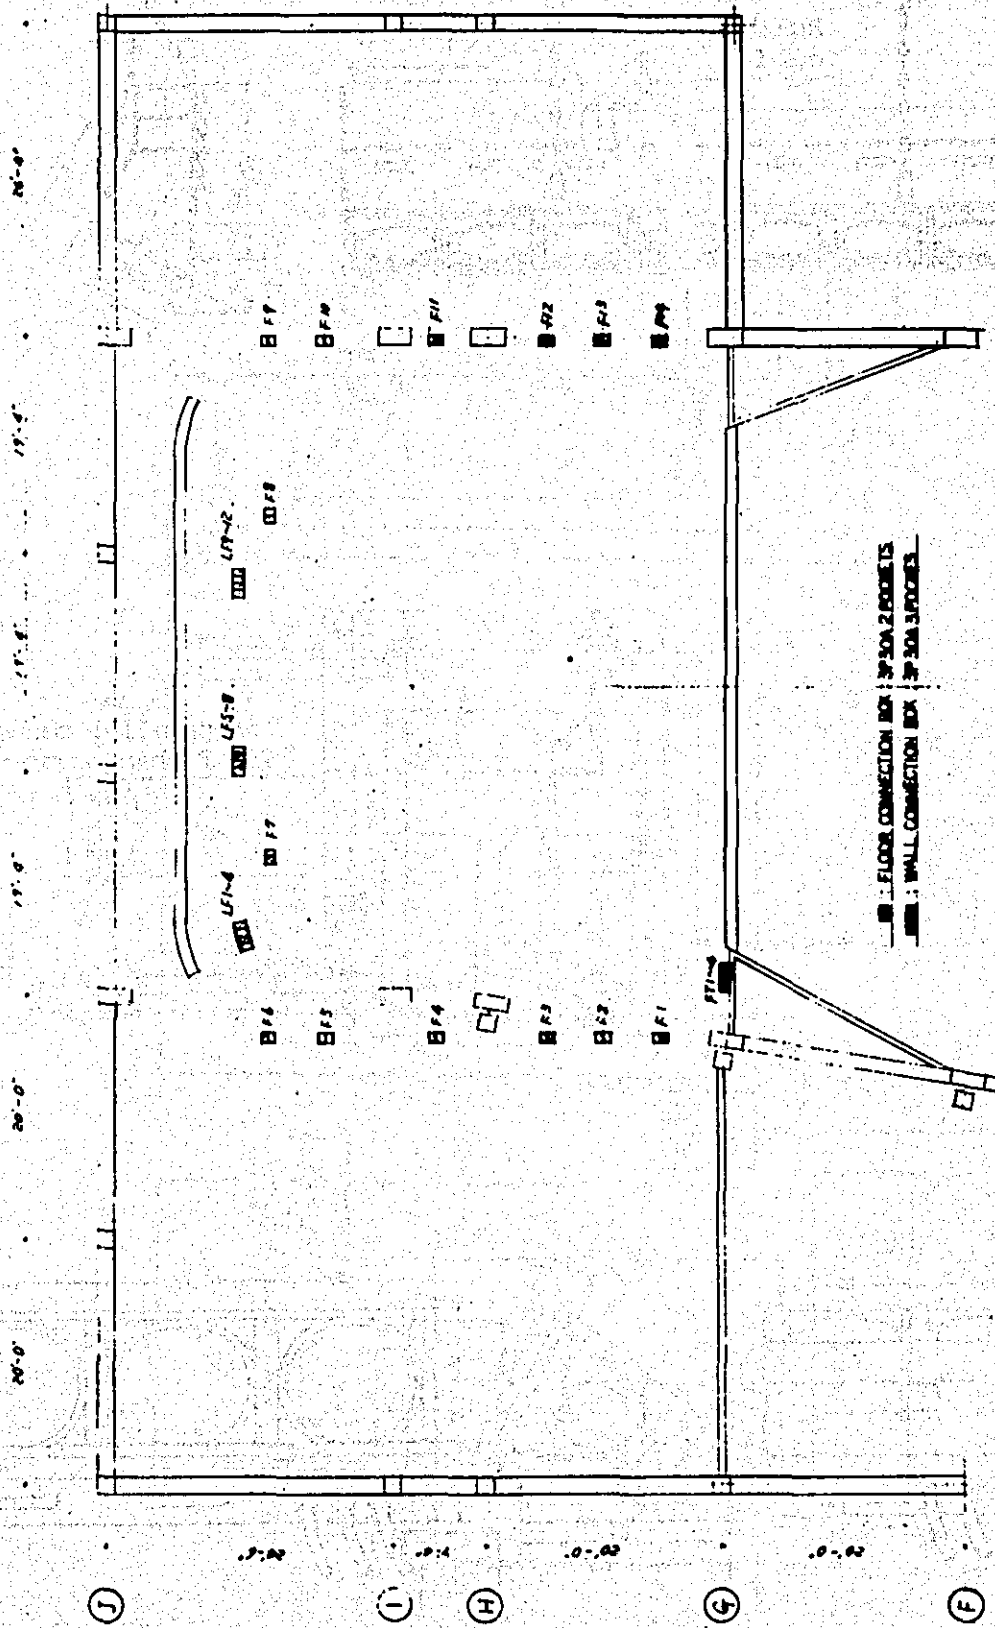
Scheme of Floor Inlet Boxes on Stage
